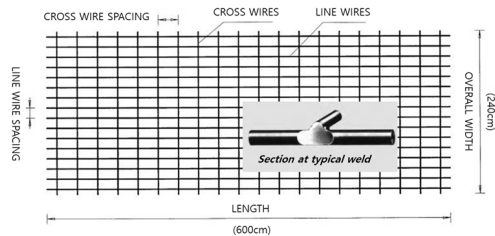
Standard dimensions(6.00 m × 2.40 m) for Welded bar reinforcement mat
